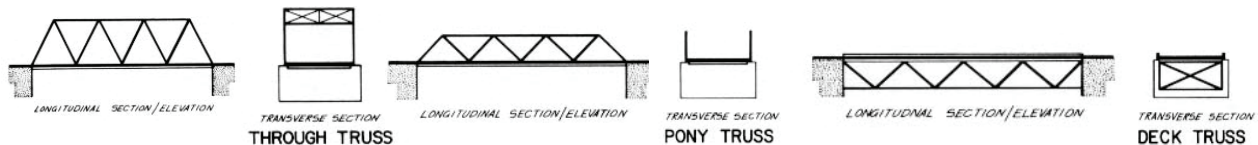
Simple early steel truss bridge types (Comp and Jackson 1977:3).
